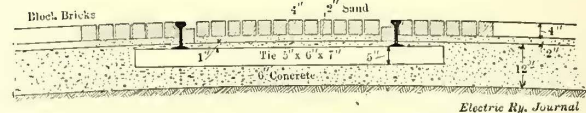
Illinois Traction System—Standard T-Rail Construction in Brick Pavement
